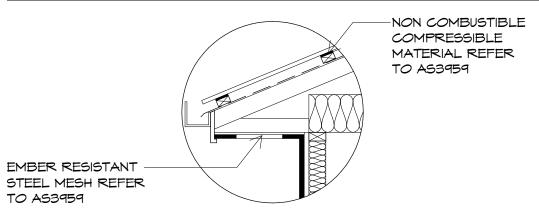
EAVED ROOF WITH BUSHFIRE CONSIDERATIONS SHOWN
